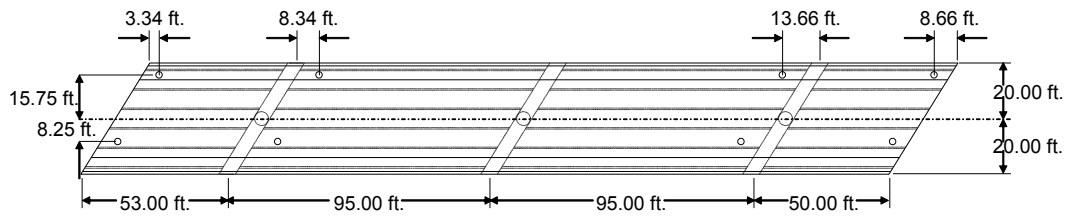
Plan View of Voigt Drive / I-5 Overcrossing
